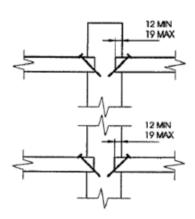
Exterior Connection: Top/Bottom Rail Skew Nailed to Post – 76 mm (3") Nails
